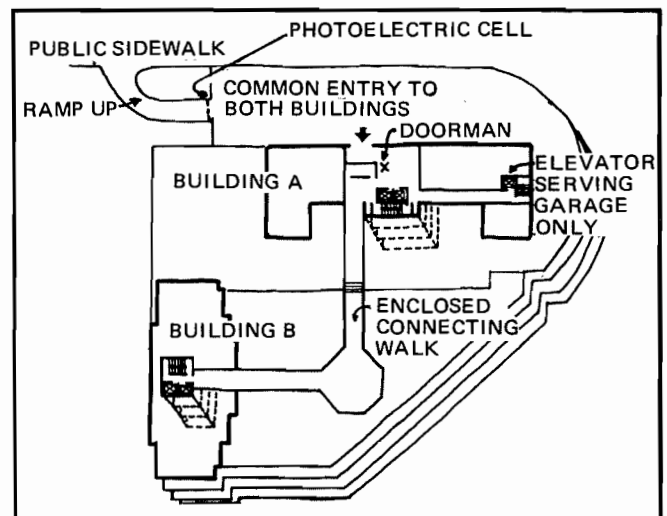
Ground-Floor Plan of 560 Riverside Drive
